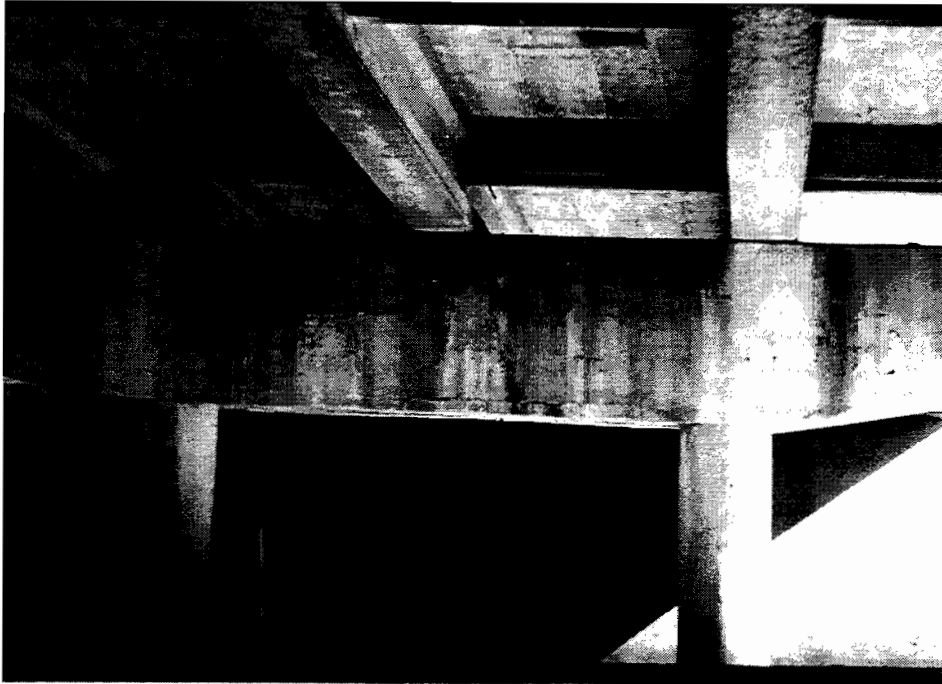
Typical spalling located on pier caps — Amarillo
